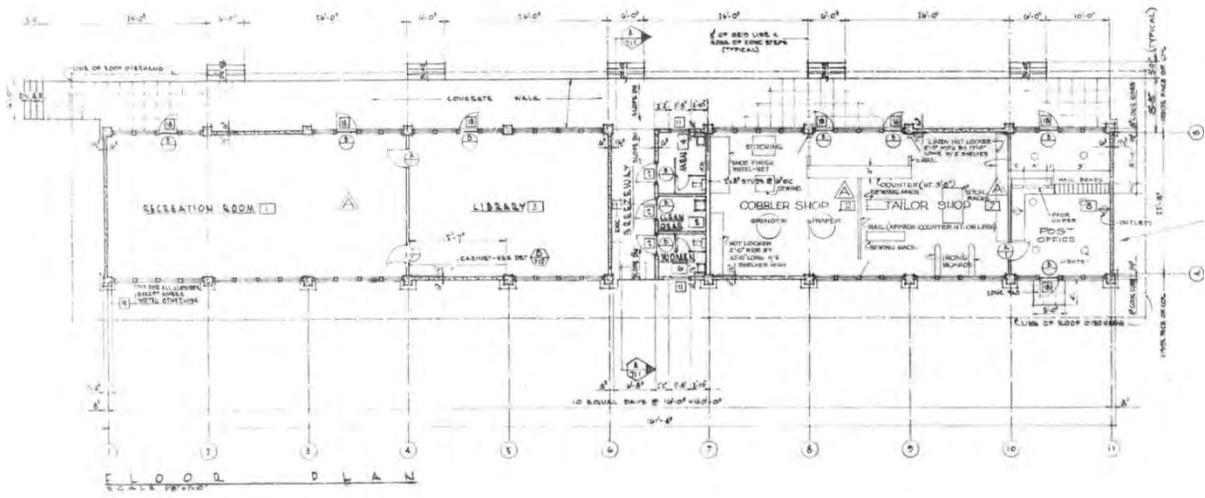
As Built plan view of Feature 74, Recreation Building B.
